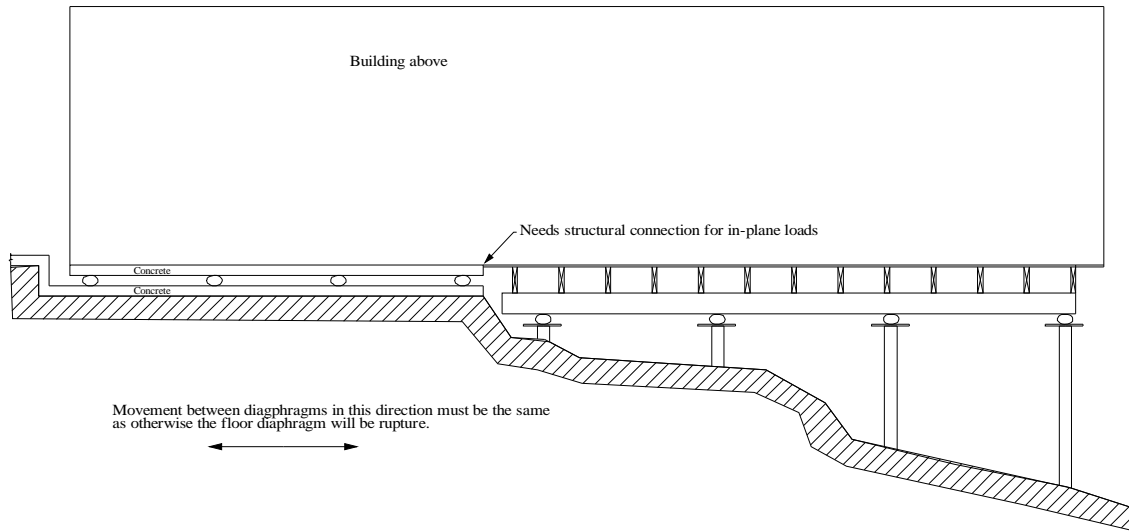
Figurative view of isolation of mixed concrete/timber floor systems.
